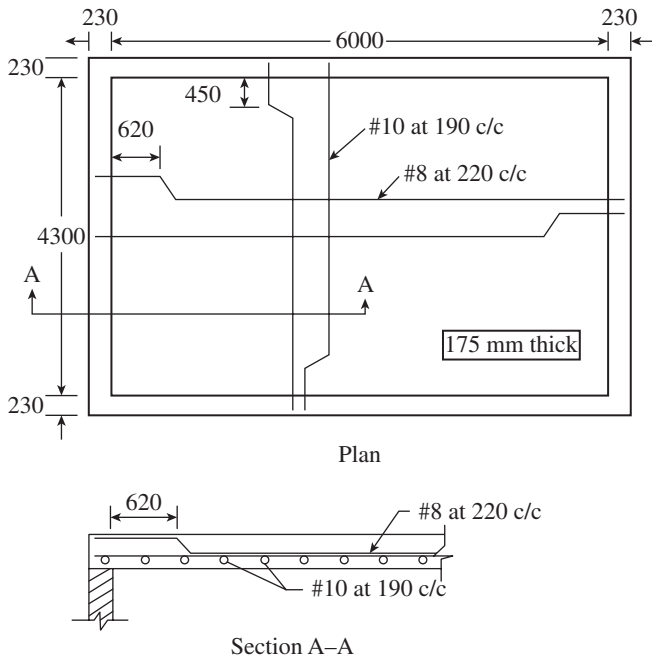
Reinforcement detailing for slab of Example 10.1
